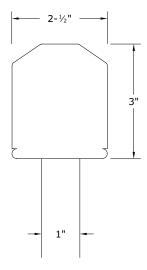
Section through bannister at second floor. (NPS-SERO-CR, 2003)
